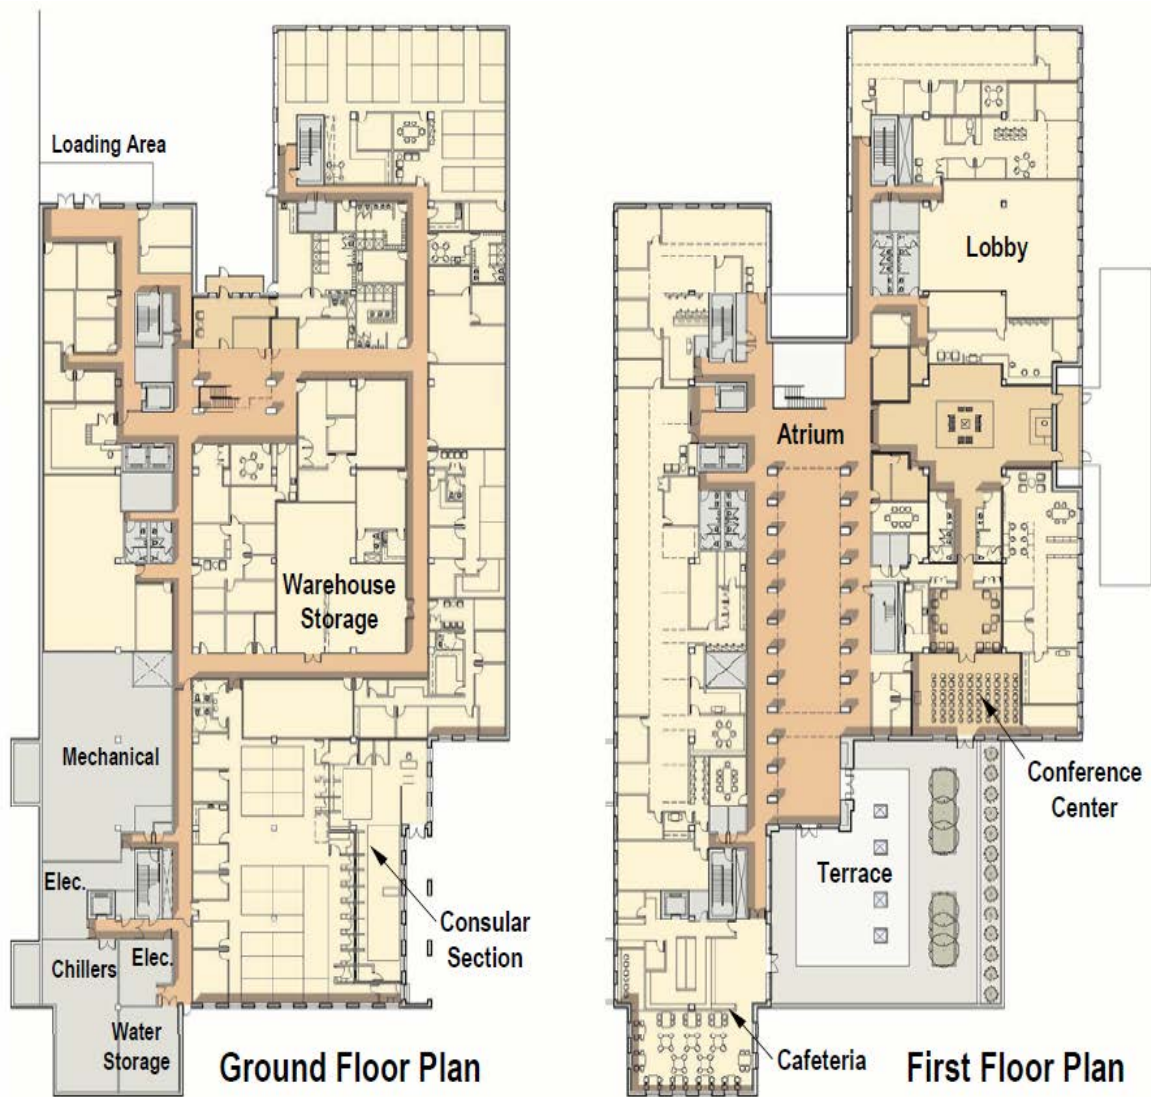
Chancery, ground & first floor plans; drawings by Zimmer, Gusul, Frasca, Inc.
